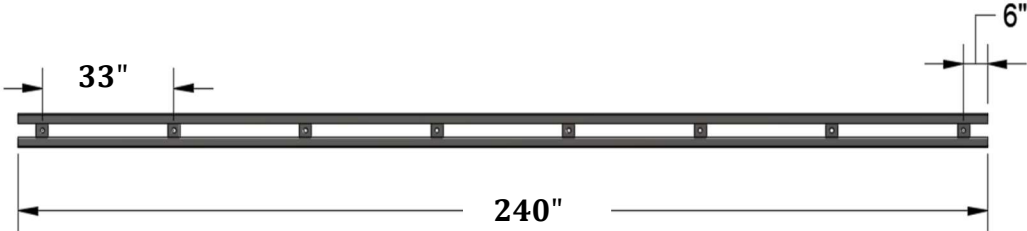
Side view, conceptual secondary beam component design, built-up girder
